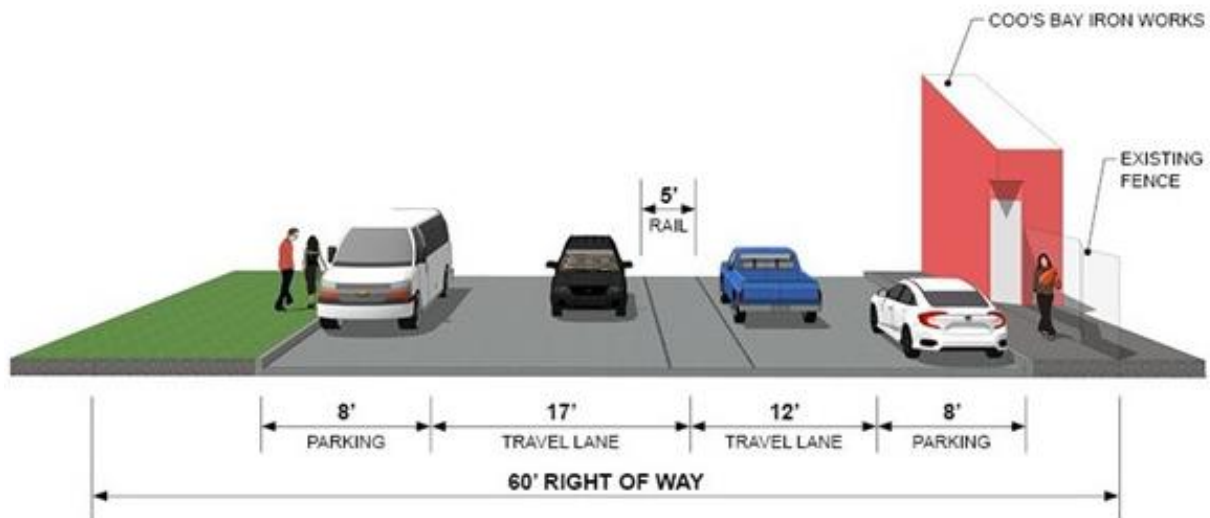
Existing Section B (Typical) - Front Street from Date Ave. to Cedar Ave.
